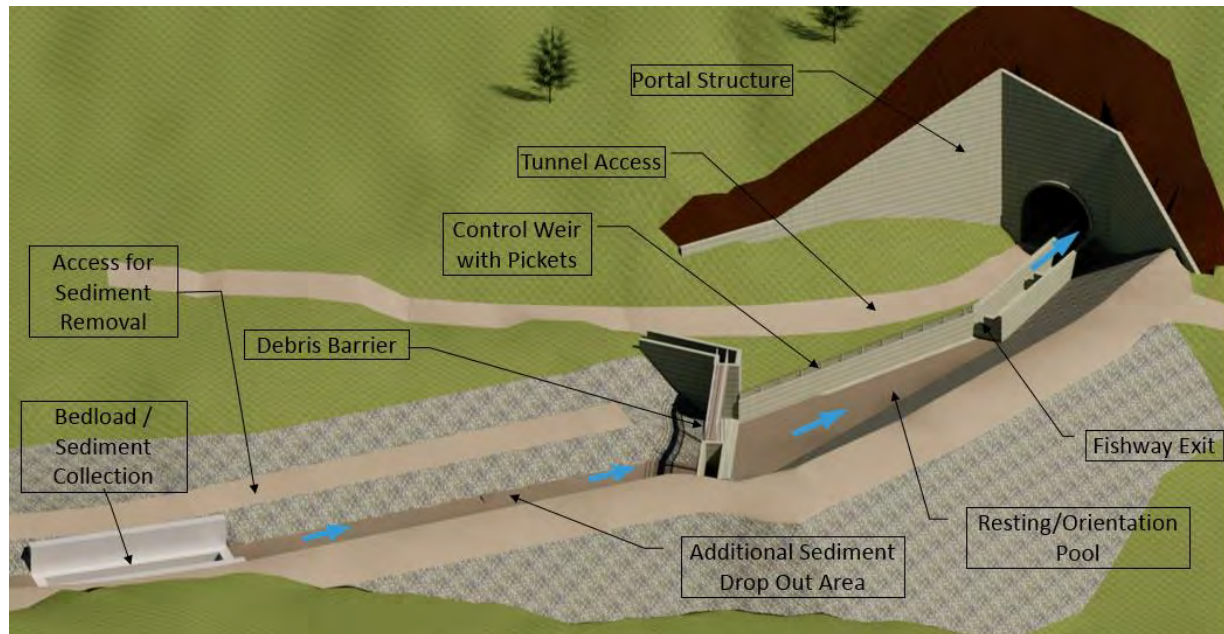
An isometric illustration of the south portal section of the EFSFSR tunnel
